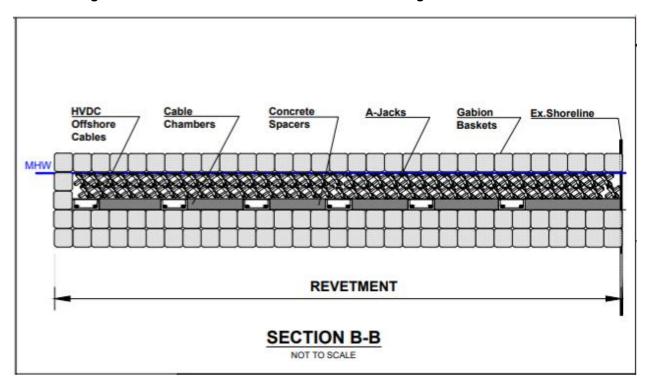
Section View of the New Revetment Along Bulkhead/Section B-B.
